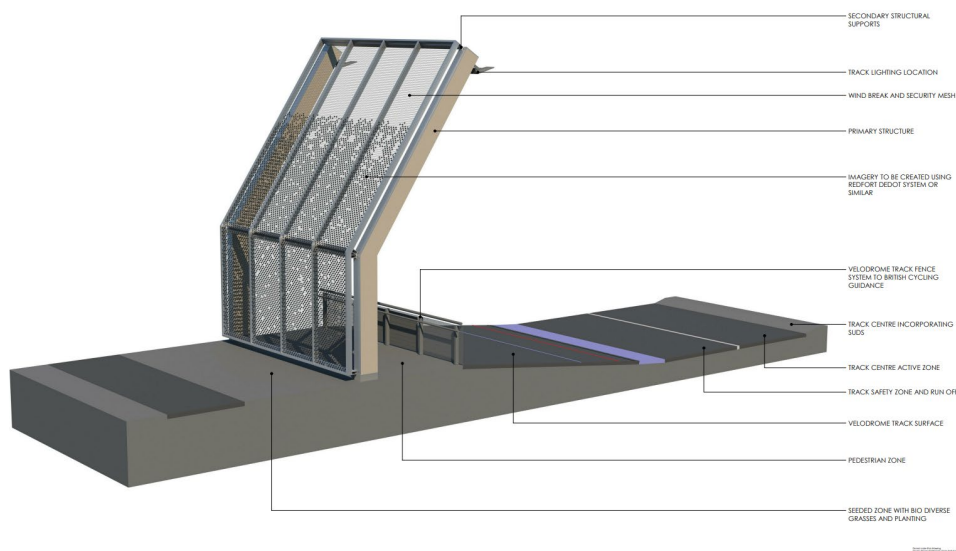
Details of Proposed Windbreak to Proposed Velodrome
